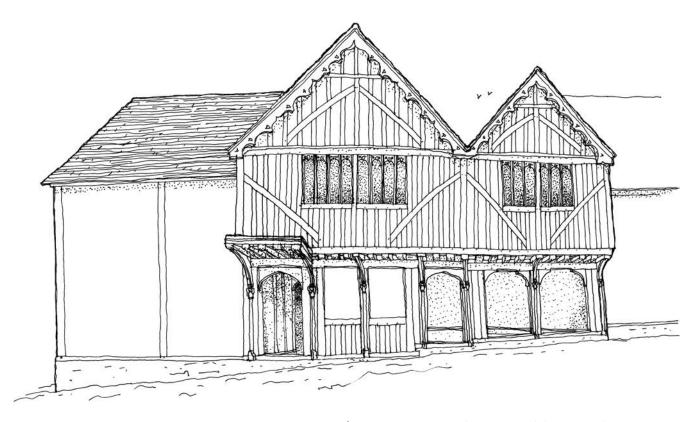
Reconstruction of the frontage of 3–6 West Stockwell Street (corpus no. 98) (not to scale)
